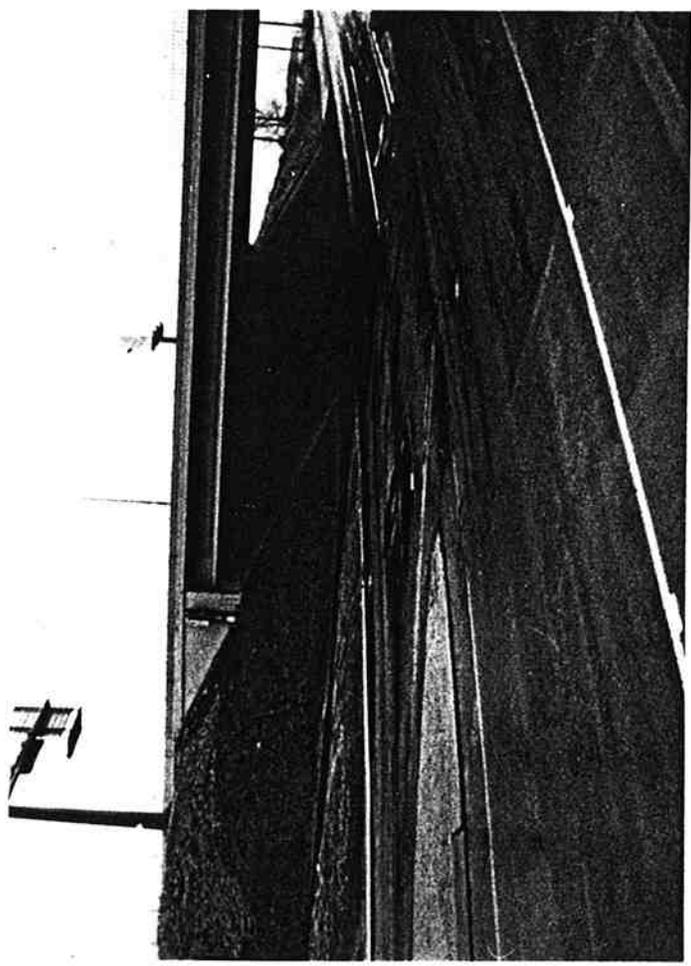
South abutment of the Oregon Slough Bridge prior to any soil nailing activities
